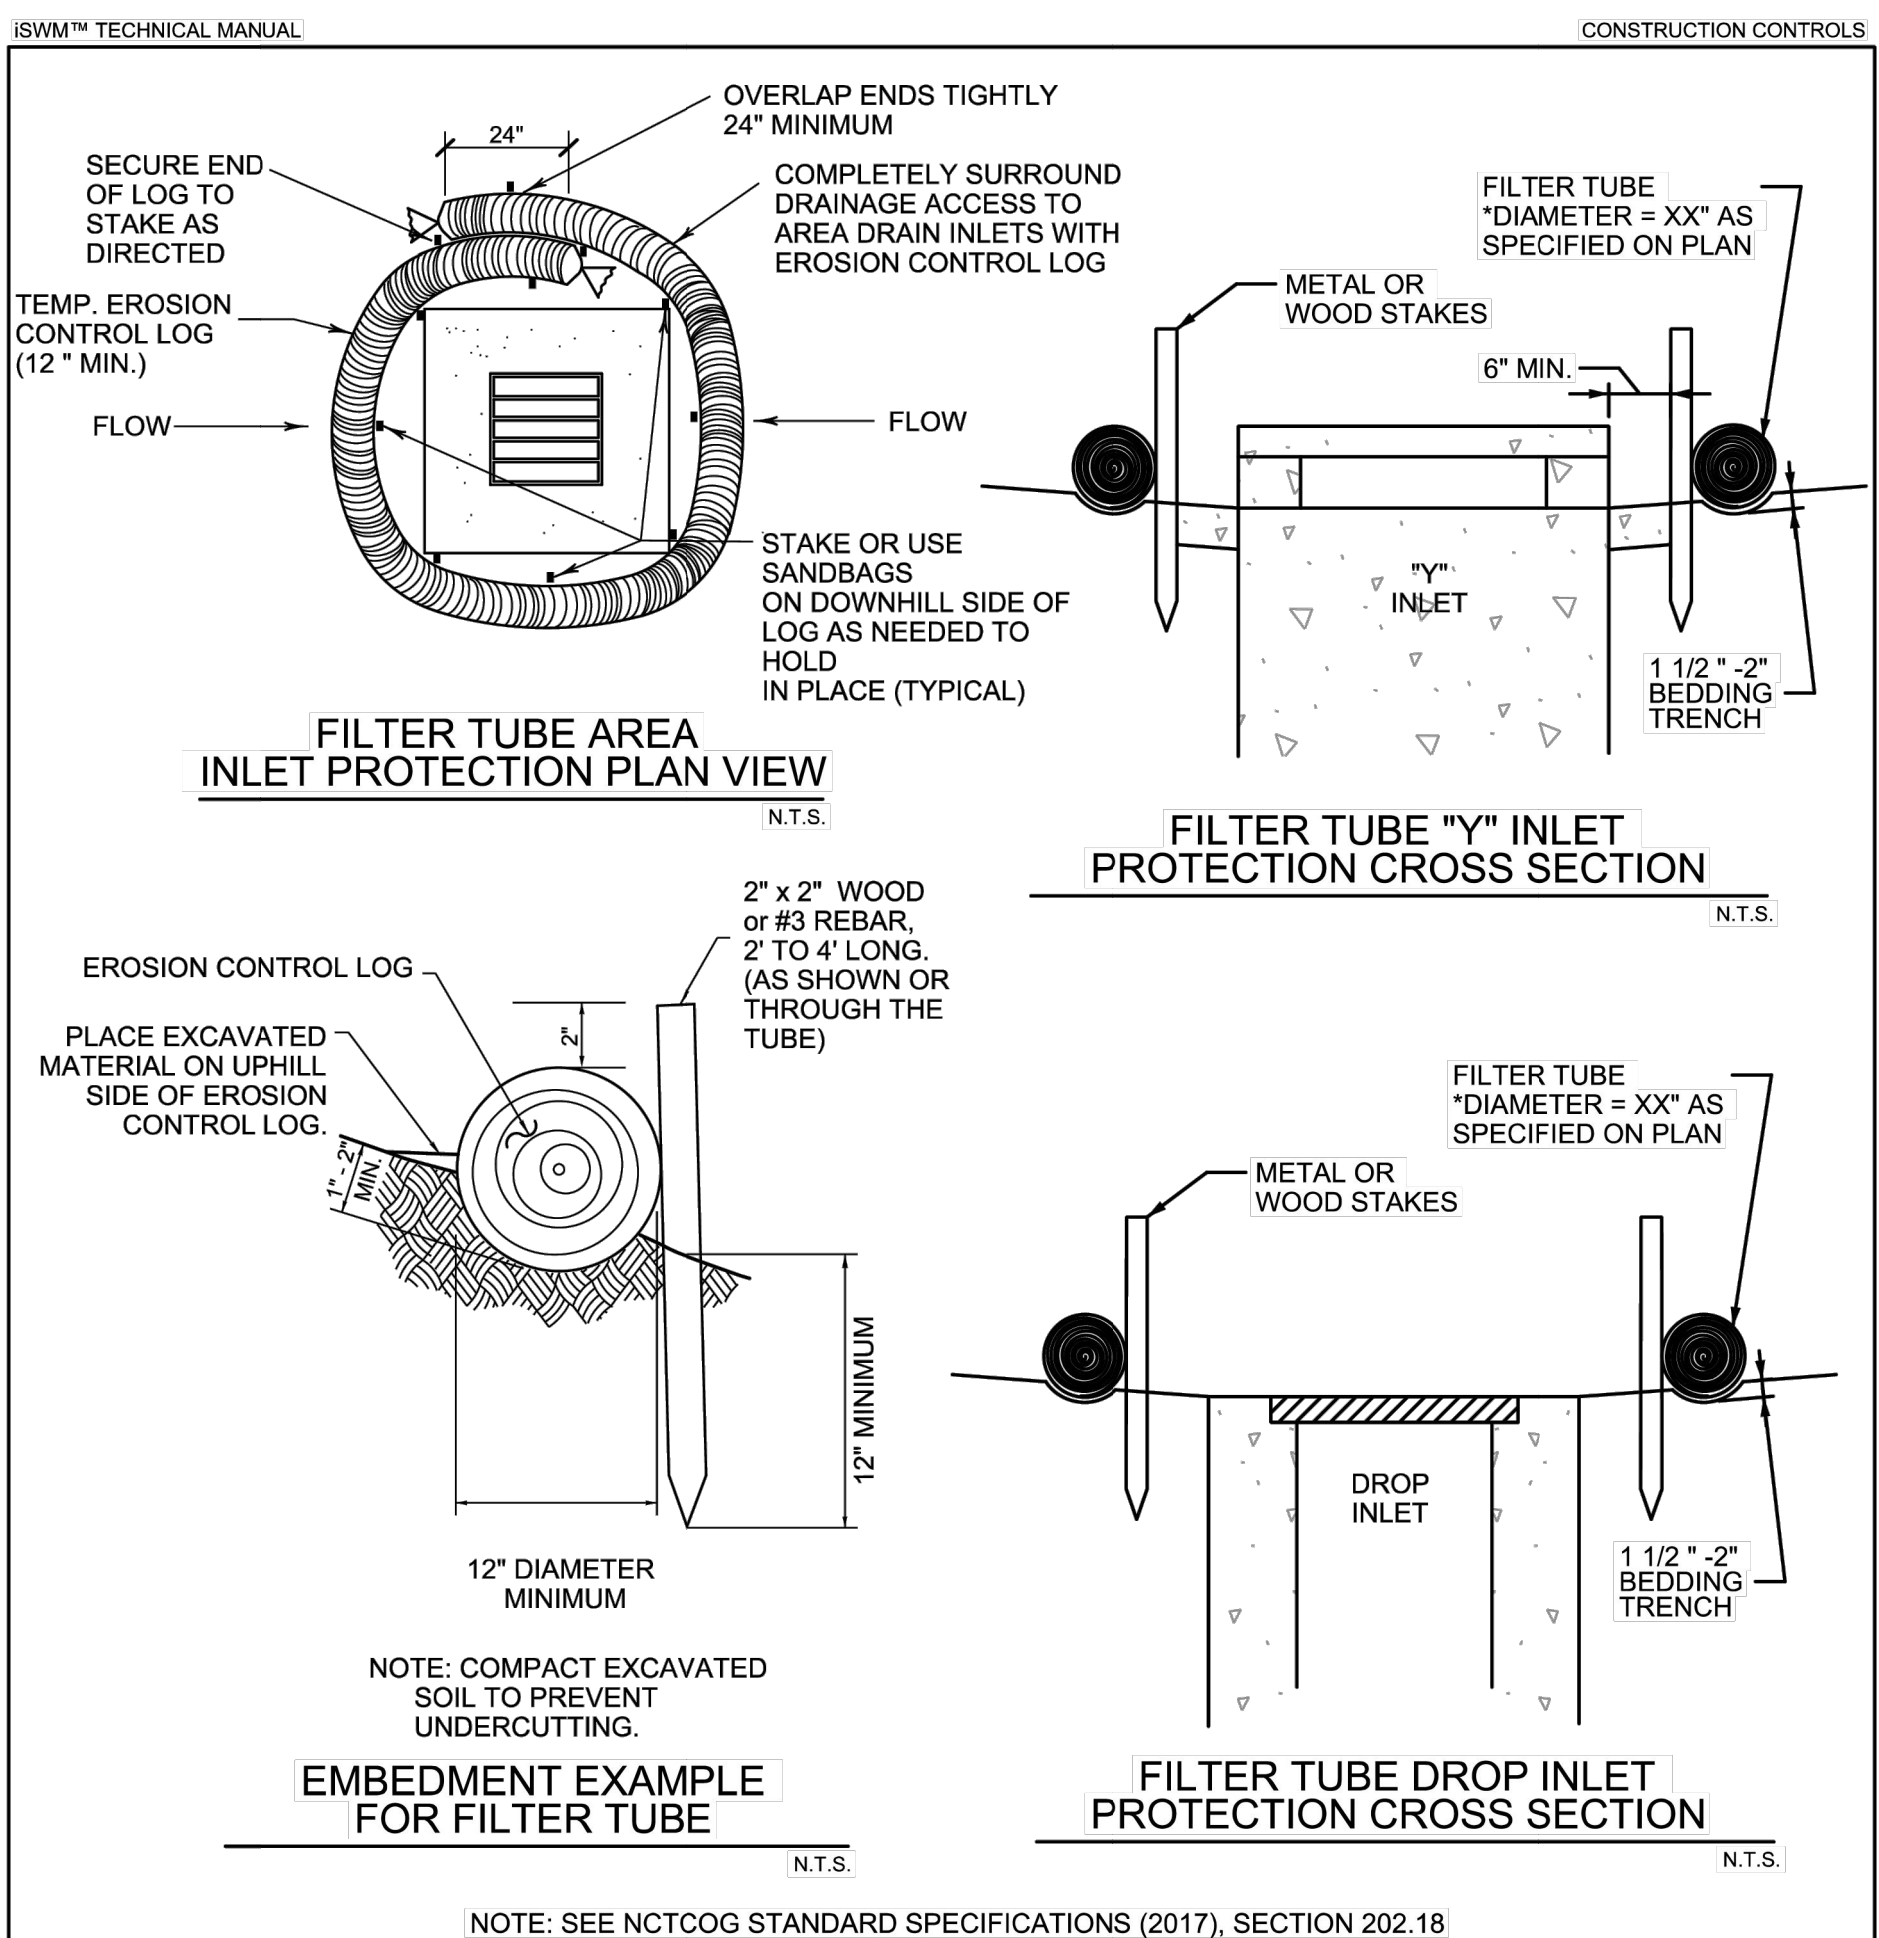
STANDARD CONSTRUCTION DETAIL - FILTER TUBE AREA INLET PROTECTION
